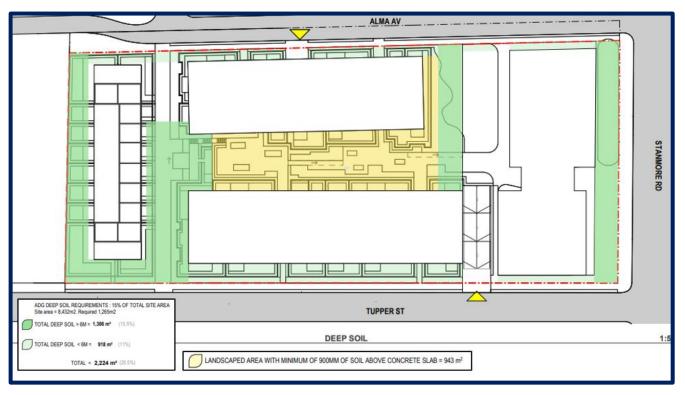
Proposed deep soil areas (Source: the planning proposal)
